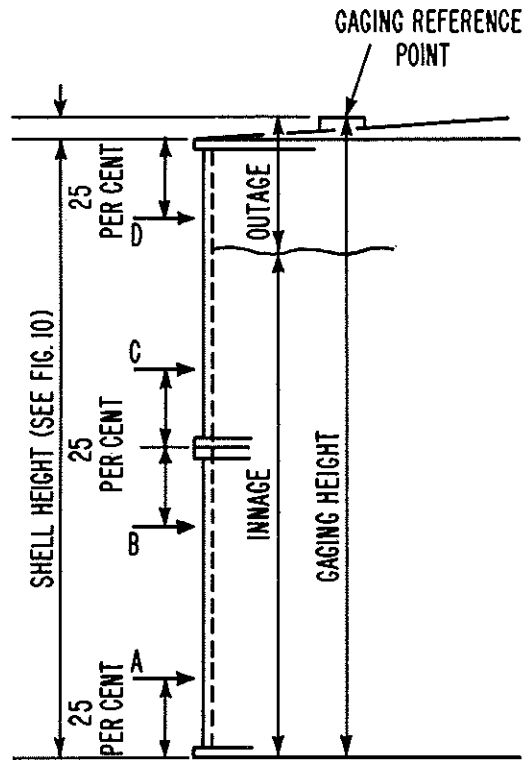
LOCATIONS OF MEASUREMENTS ON UPRIGHT CYLINDRICAL TANKS, ONE COURSE HIGH WITH RIVETED VERTICAL LAP JOINTS.
